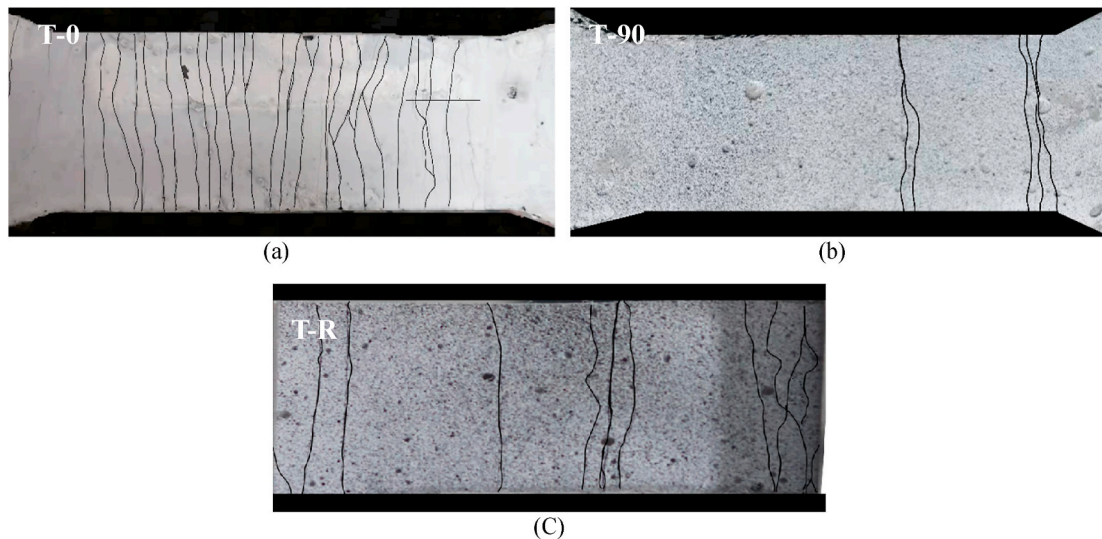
Crack patterns of (a) T-0, (b) T-90, and (c) T-R specimens.
